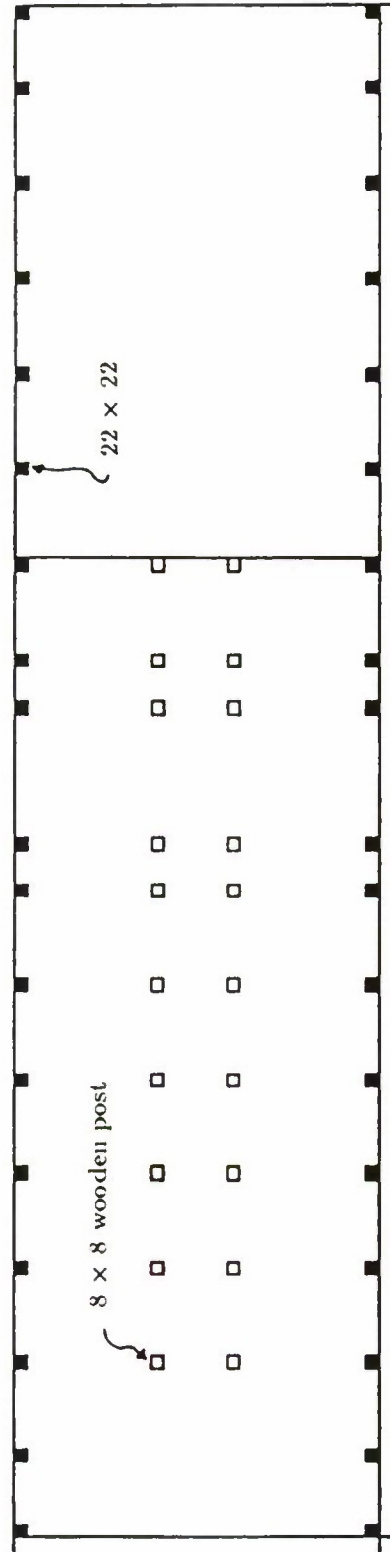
Columns and beams on the third floor (supporting the fourth floor).
